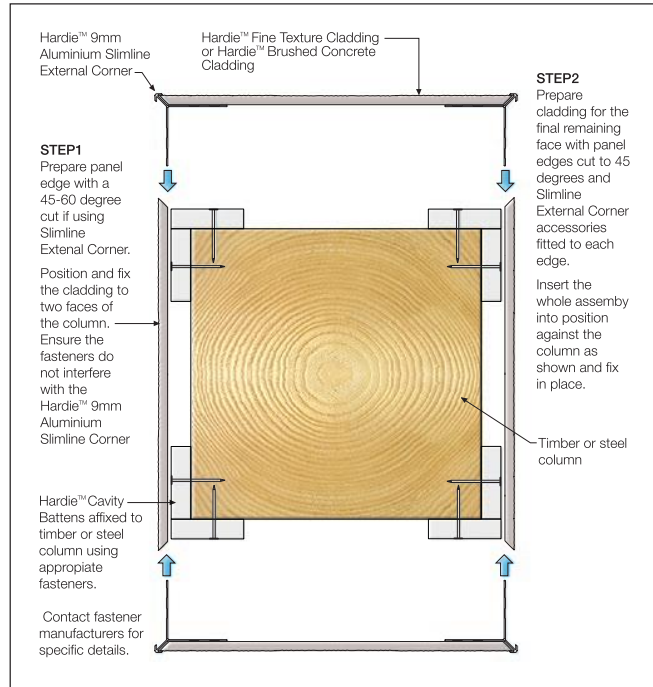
FIXING TO TIMBER OR STEEL COLUMN
